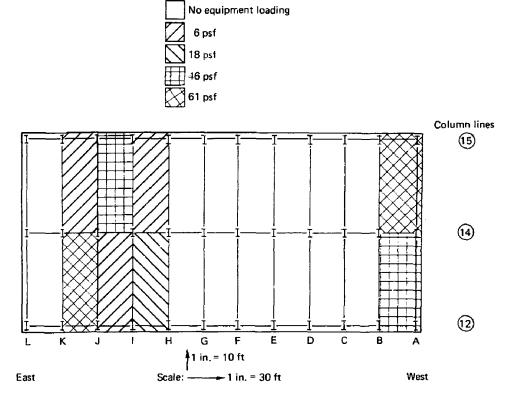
Low bay roof equipment loads (supplied by MFTF personnel).
